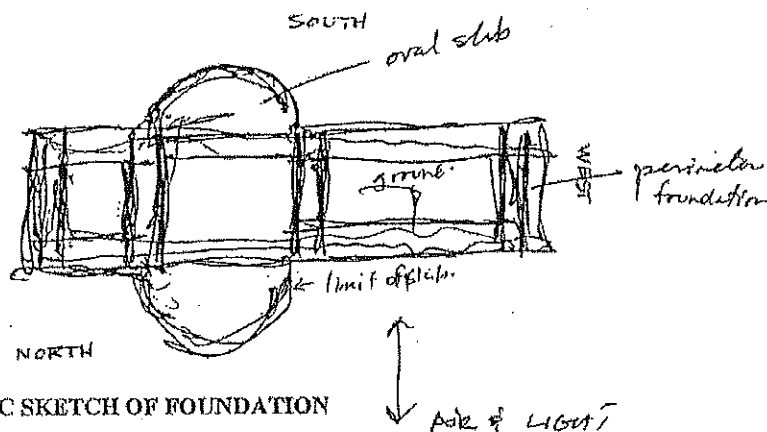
SCHEMATIC SKETCH OF FOUNDATION
